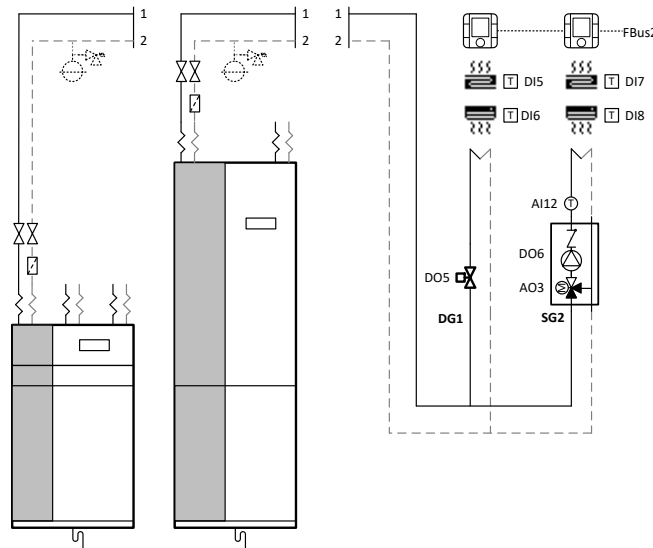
Wiring scheme 2-zones directly to the heating / cooling system.
